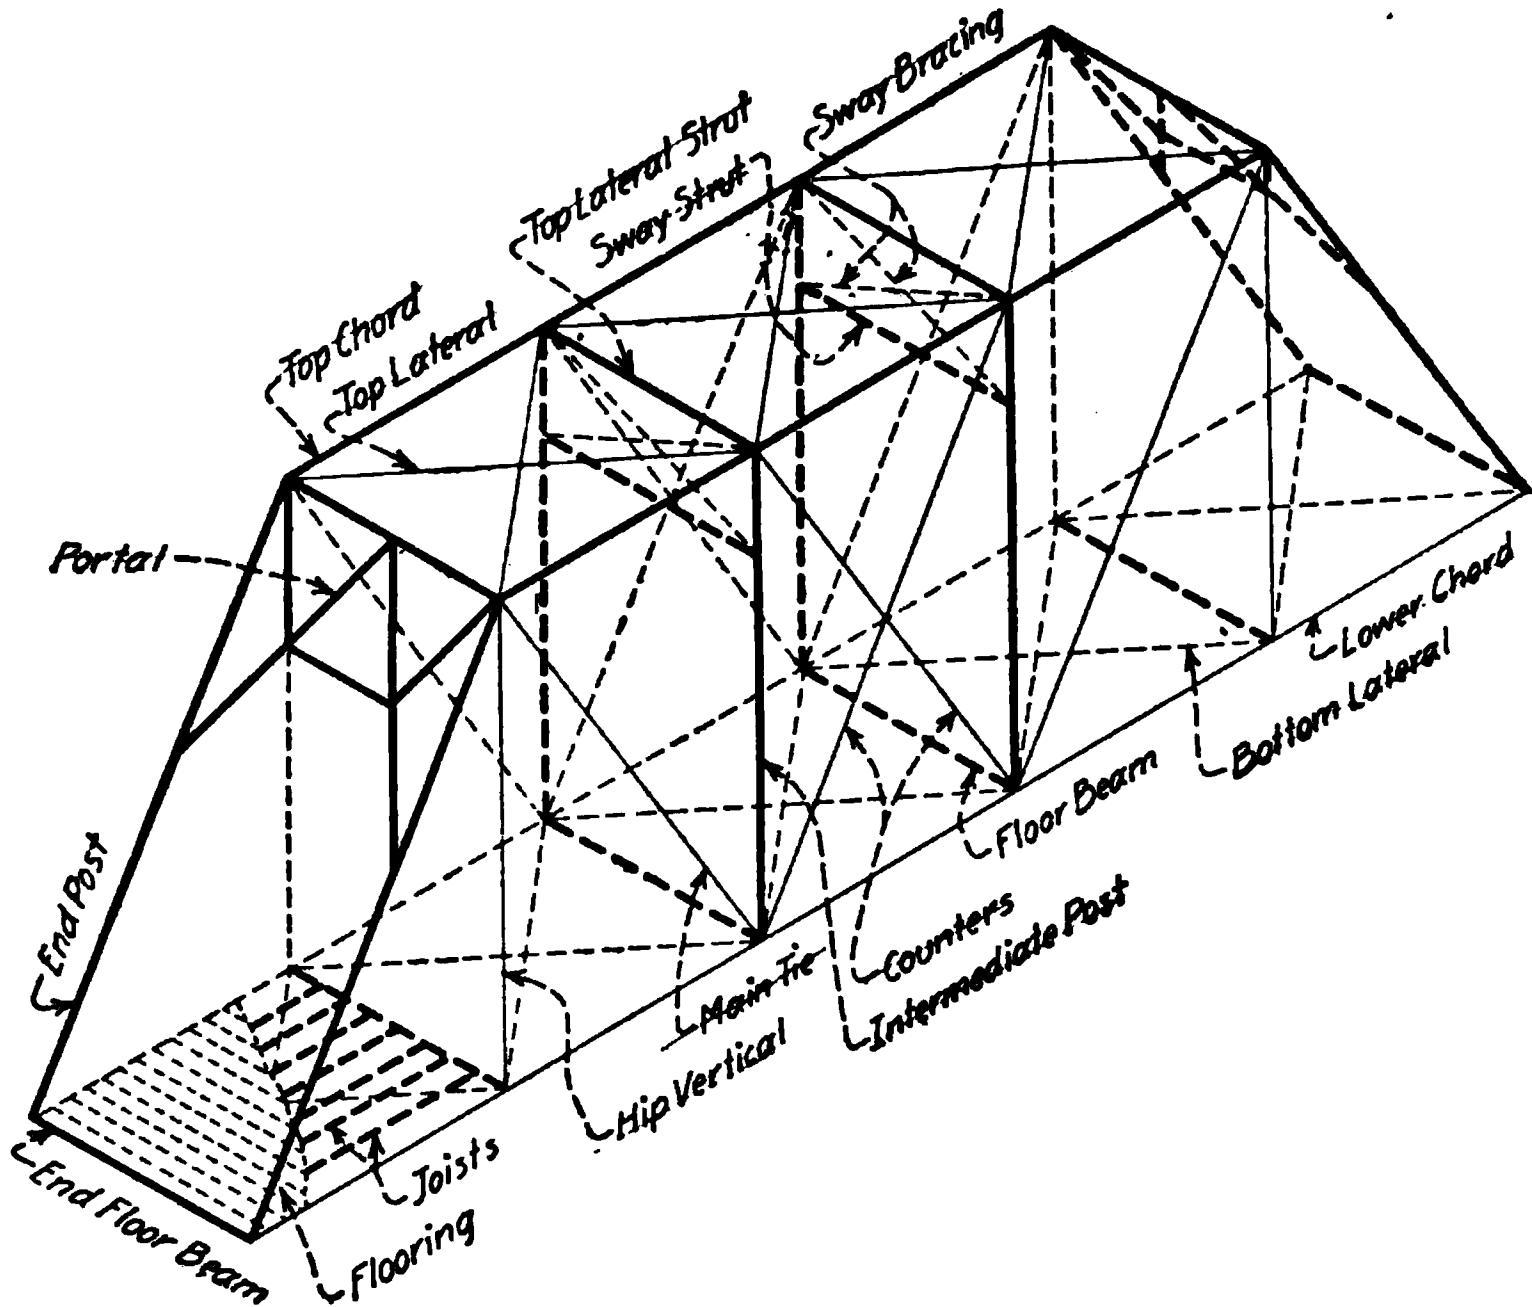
DIAGRAMMATIC SKETCH OF A THROUGH PRATT TRUSS HIGHWAY BRIDGE.
